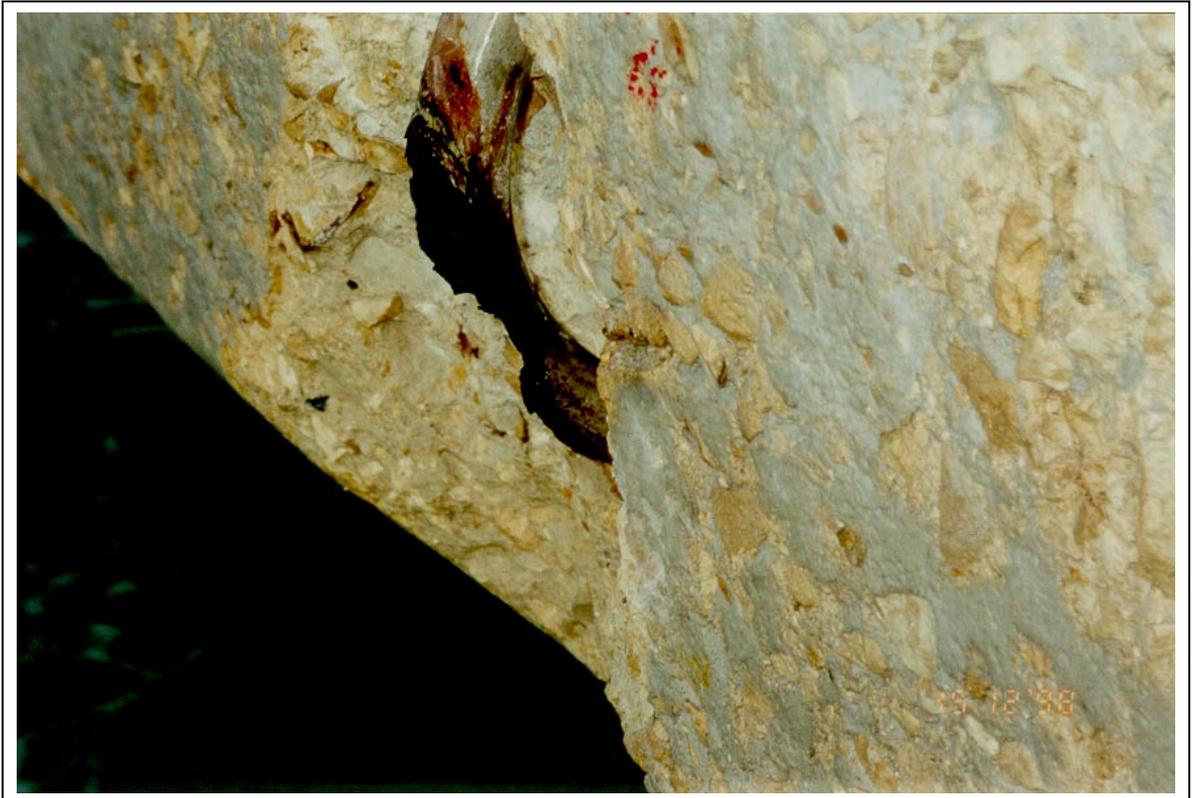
Reinforcement at break-up no. 3 (after removal of reinforcement sample)
